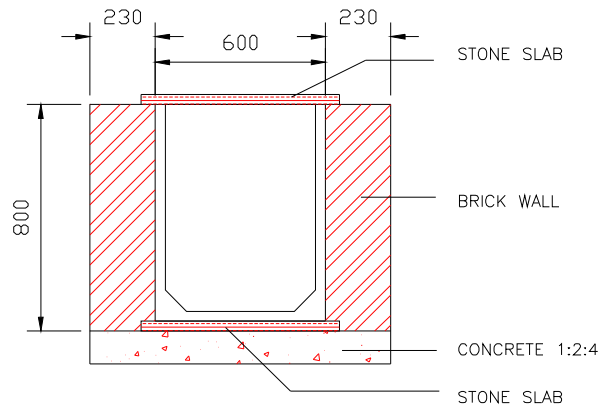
Cross-section of pipe at the Dilwara Bagh House, Gurgaon
